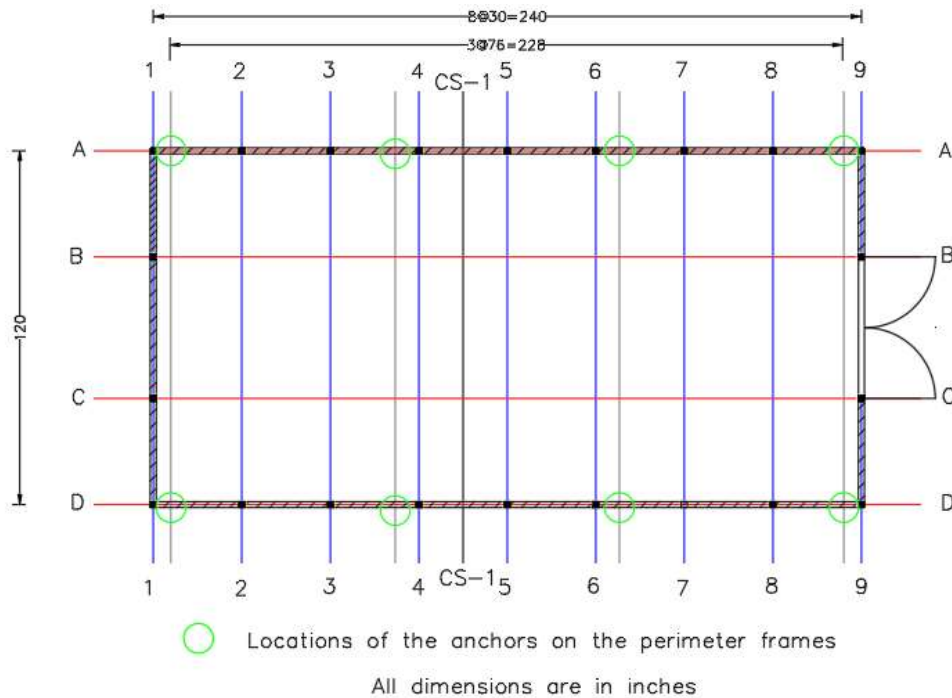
Plan view showing the location of the anchors on the perimeter frames
